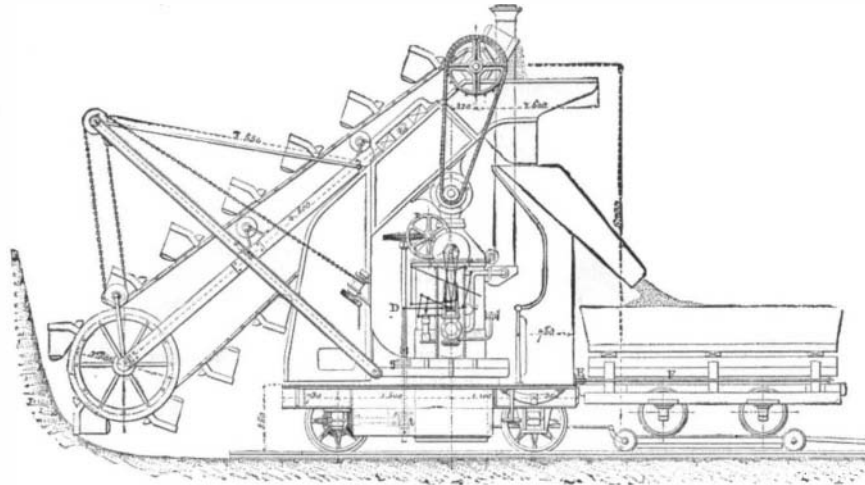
ELEVATION.—EXCAVATOR WORKING IN A TRENCH.
